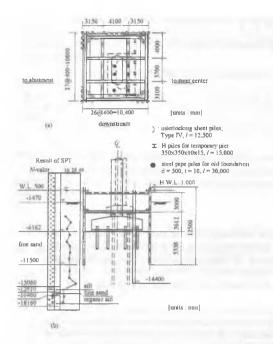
Cofferdam for Pier No. 1 of Daiichi-Shinkawa Bridge (a) plan view; (b) side view
